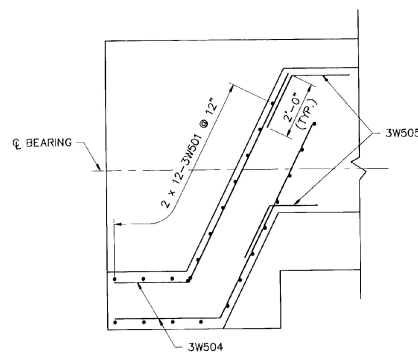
REINFORCING ABOVE LEVEL OF BRIDGE SEAT
